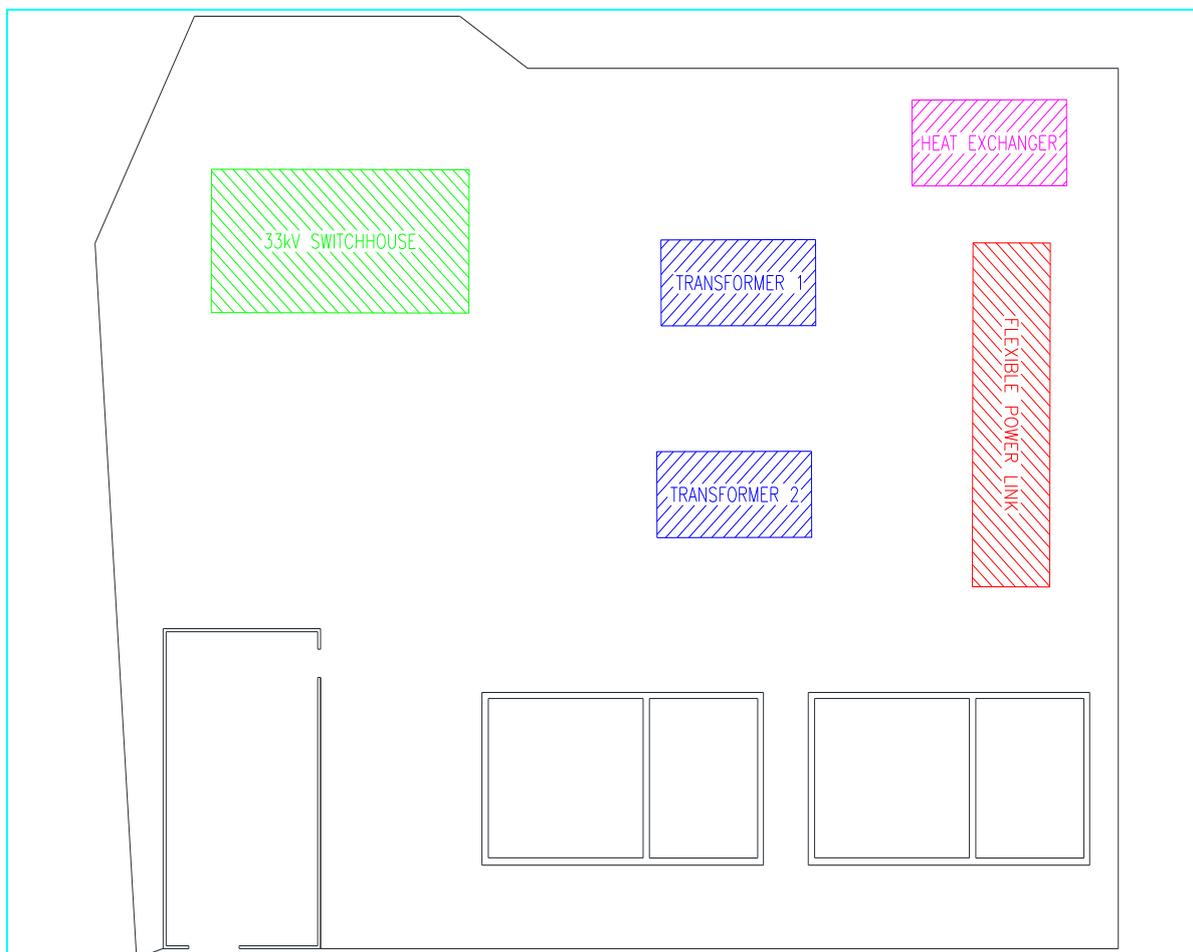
Proposed FPL and 33kV Switchhouse Layout at Tiverton Moorhayes
